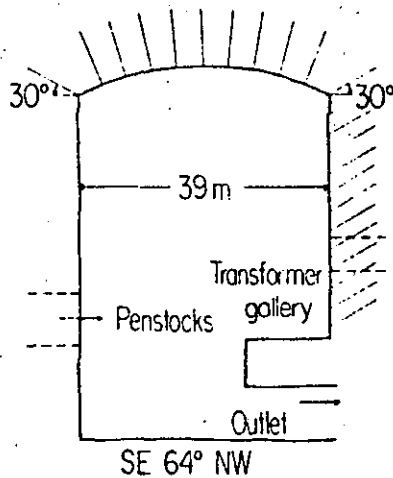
Cross section SE 64° NW of the powerhouse showing recommended bolting
